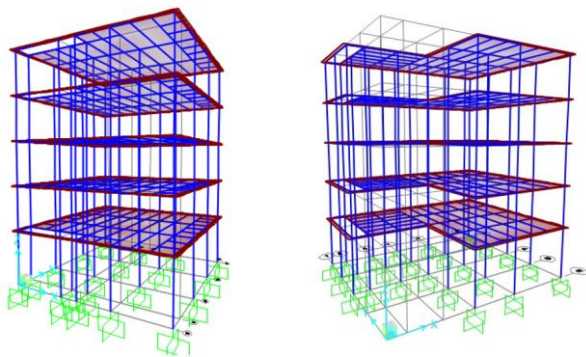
SAP2000 models: Building 1 (left) and Building 2 (right)
